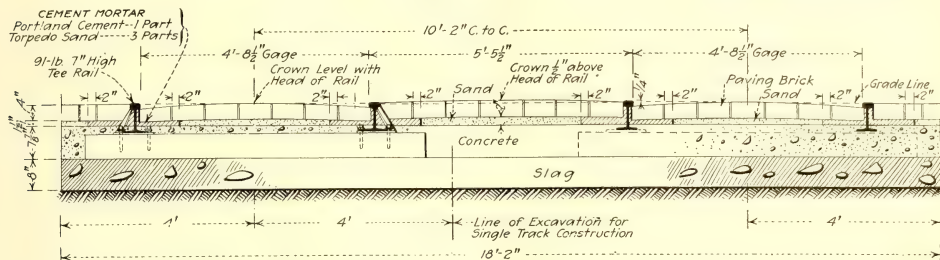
CHICAGO STANDARD TRACK TYPE NO. 4; SLAG FOUNDATION WITH WOOD TIES IMBEDDED IN CONCRETE
